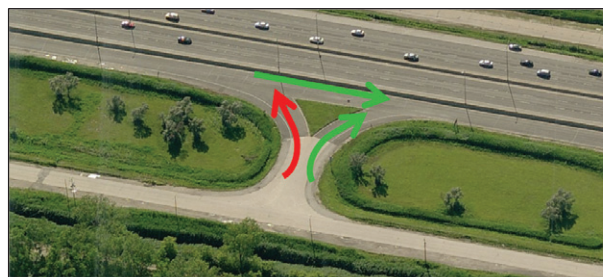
Buttonhook ramp connected to parallel to frontage road.
